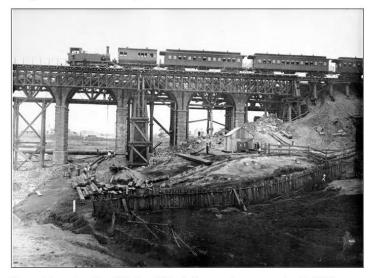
Long Cove Creek Viaduct Whipple Truss under construction (c. 1886). State Archives NSW
